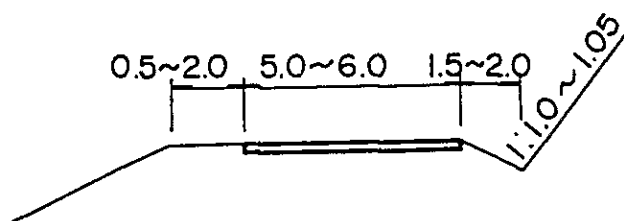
Cross-Section of Road Structure (Llano Grande - Petaquilla)
